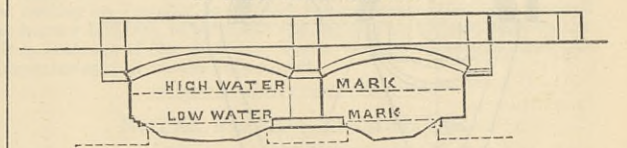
ELEVATION OF NEW IRON BRIDGE.
